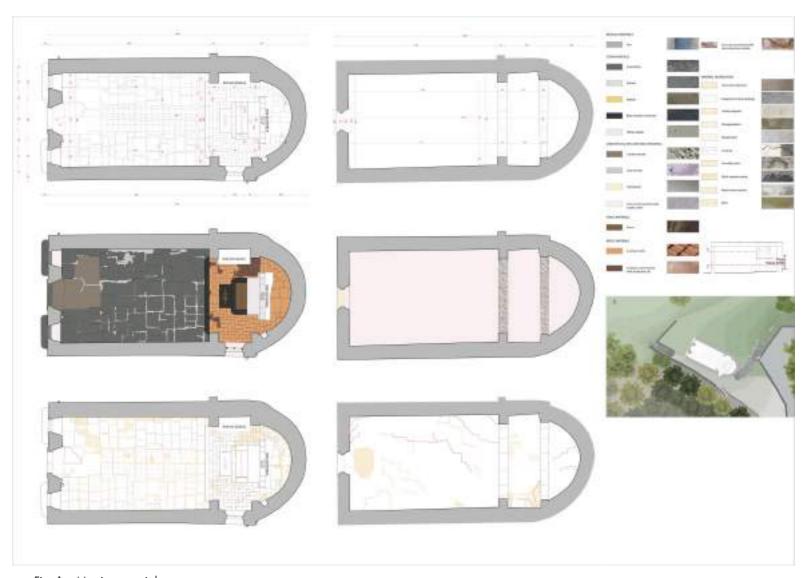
Metric, material and degradation survey: plan and ceiling.
